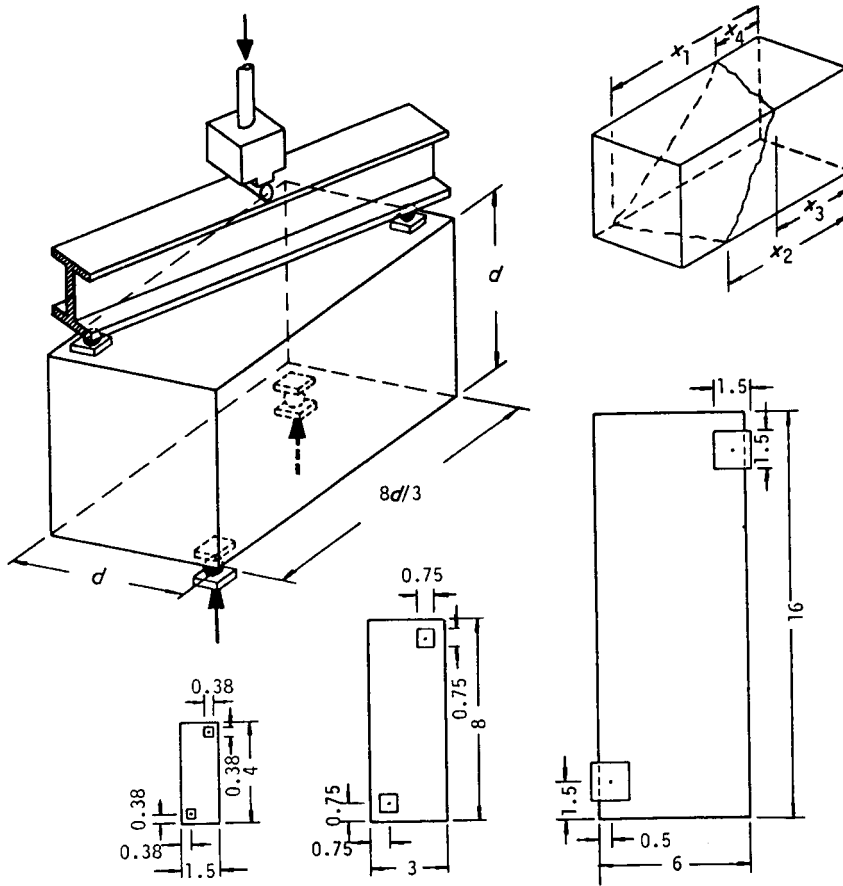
Geometry of the specimens (dimensions in inches; 1 in. = 25.4 mm).
